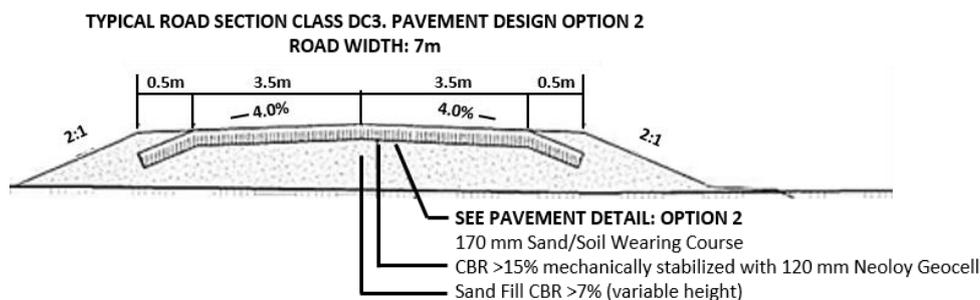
Typical road section drawing with Neoloy Tough Cell base reinforcement (Source: WSP)
